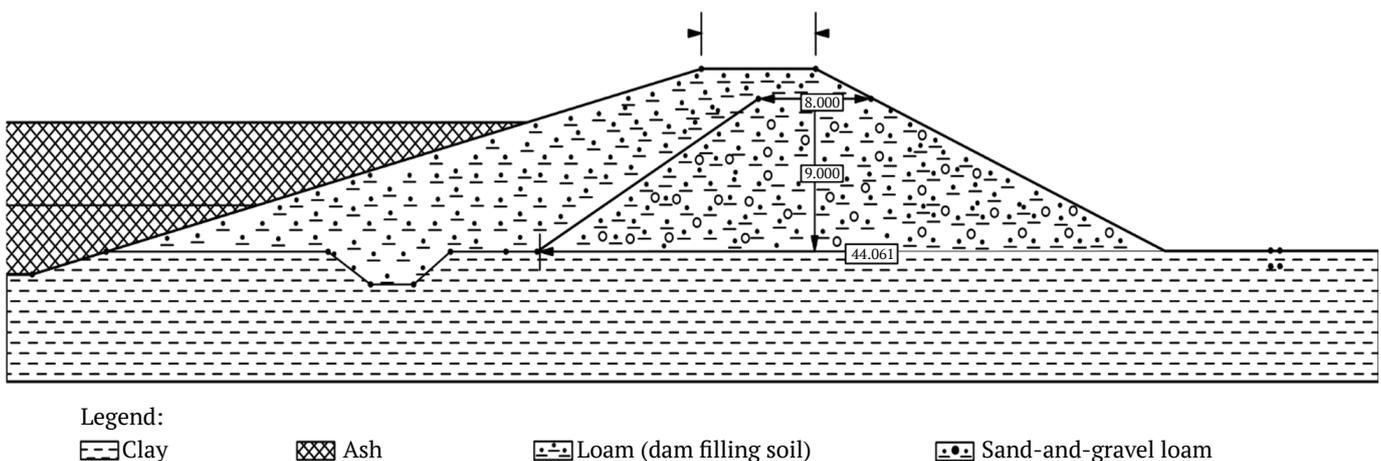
Structural cross-section of the dam body with cutoff wall and pipe drainage
